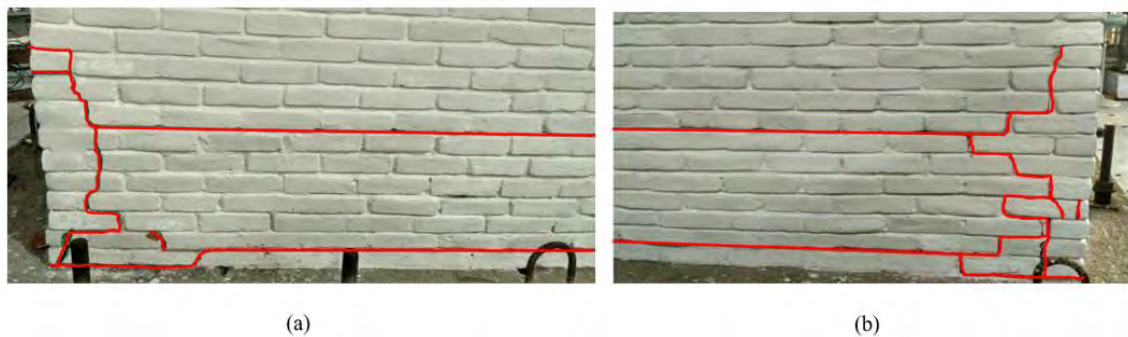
Cracks developed at 1.05g in north wall (in-plane wall)
